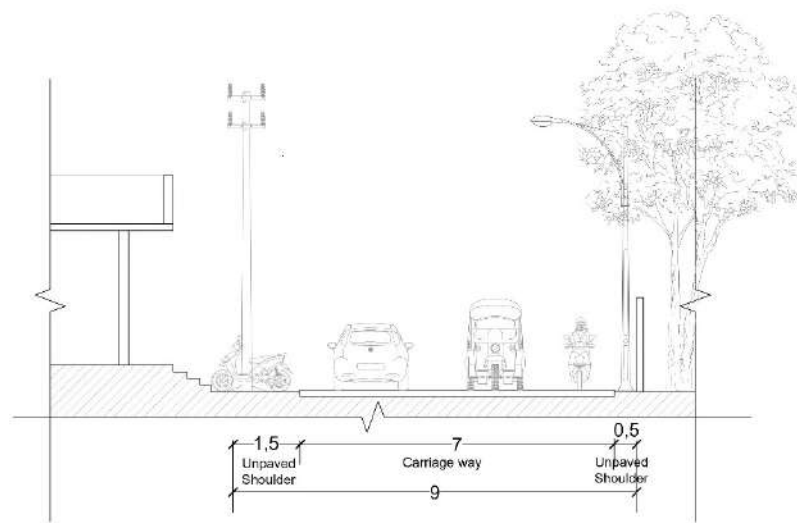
Road Cross Section: Brindavan Road near Sri Chaitanya Academy
